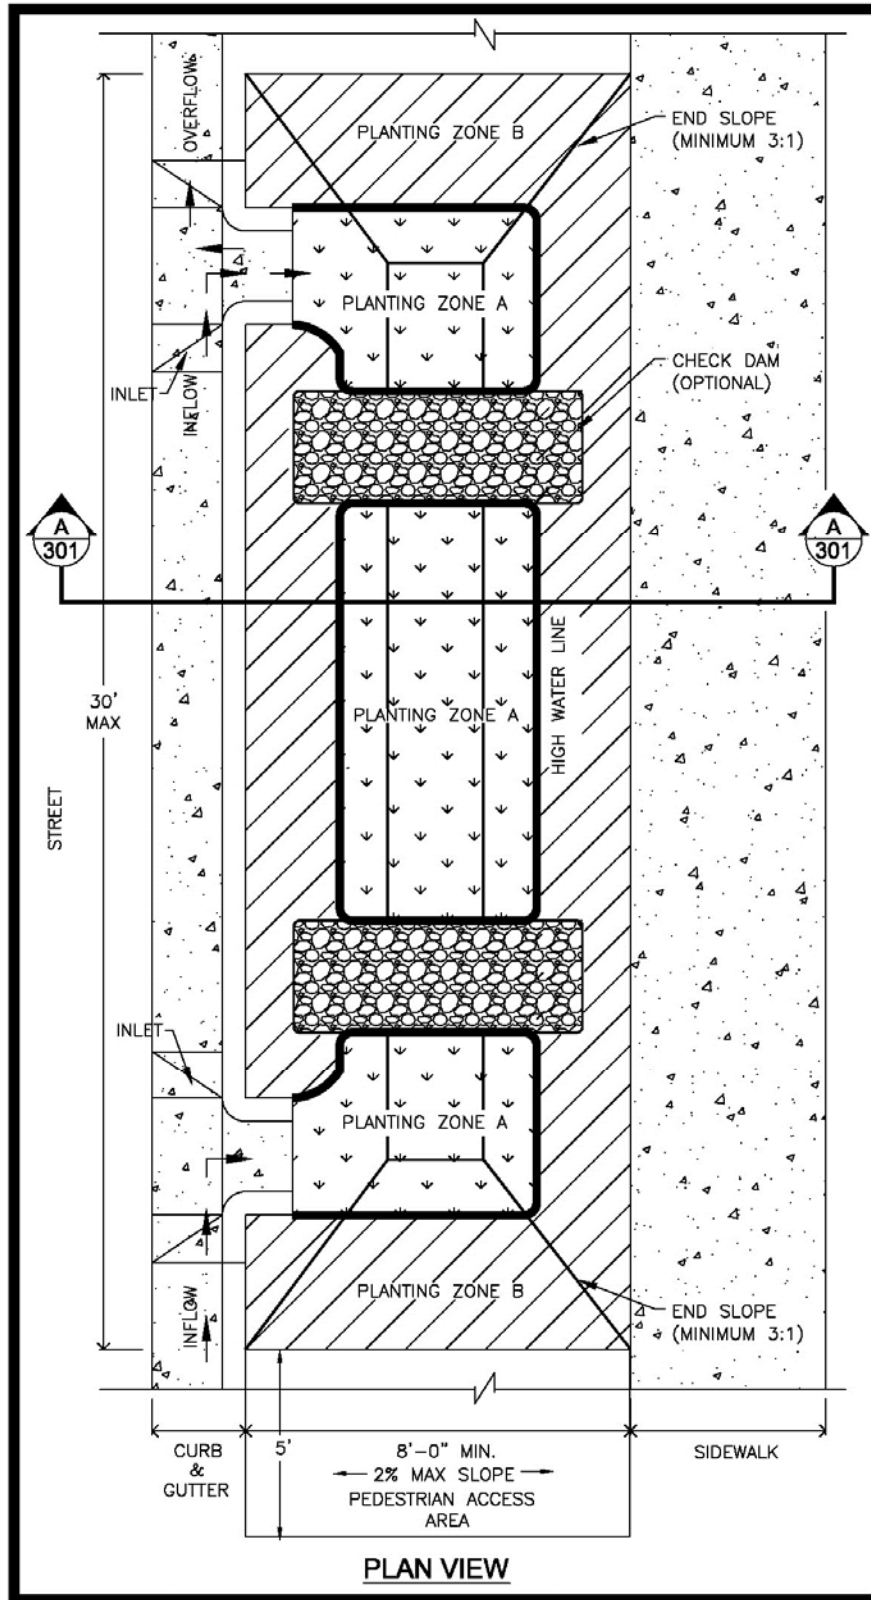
Green Streets Swale Plan View (source: Portland, 2011)
